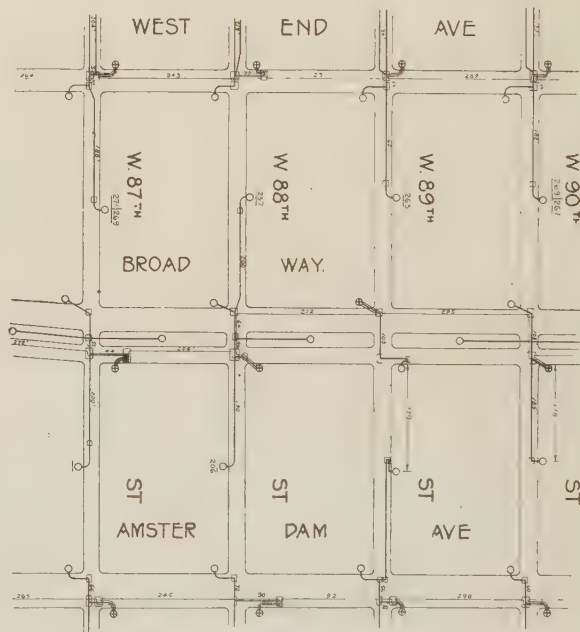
ACTUAL LAYOUT WITH LOAD WIRE AND CONTROL WIRE RUNNING THROUGH MANHOLES AND HANDHOLES
